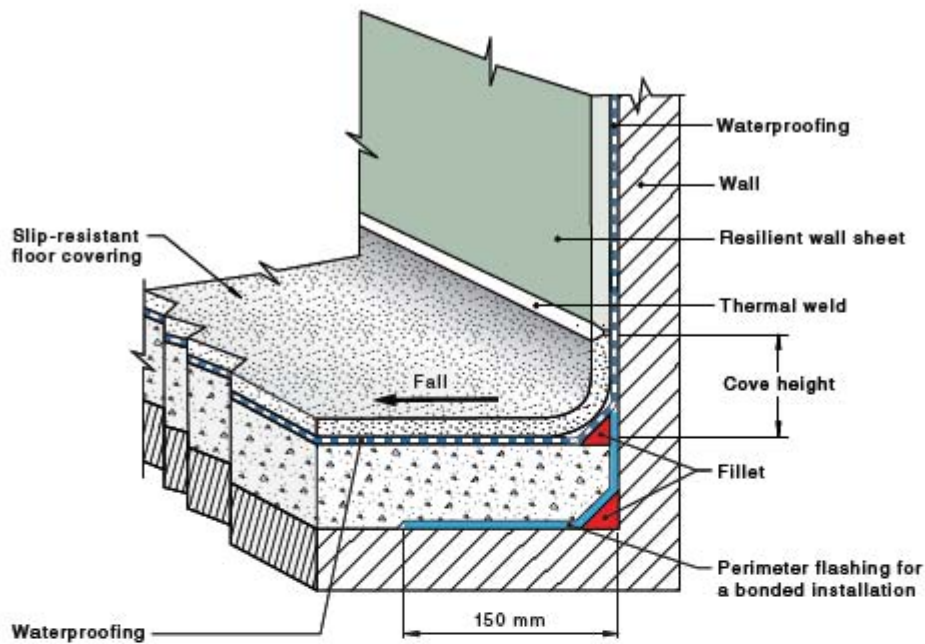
(B) — Vinyl installation — Welded method
